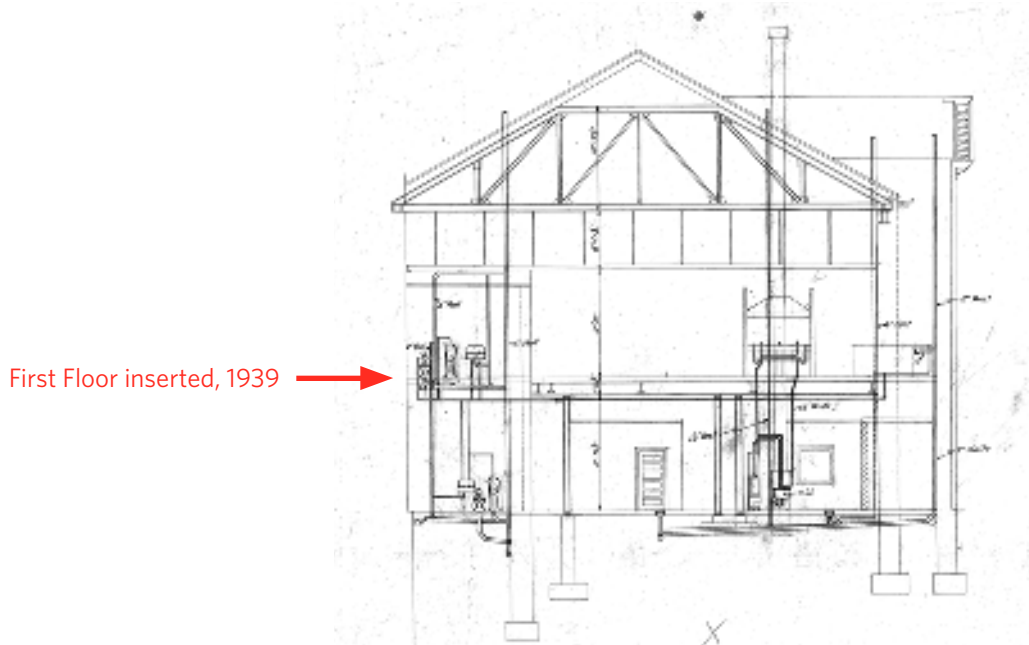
Section drawing through the Boiler House from 1939 construction drawings, looking west, showing insertion of the new floor after the boilers were removed (City of Pittsburgh, Department of Public Works).
